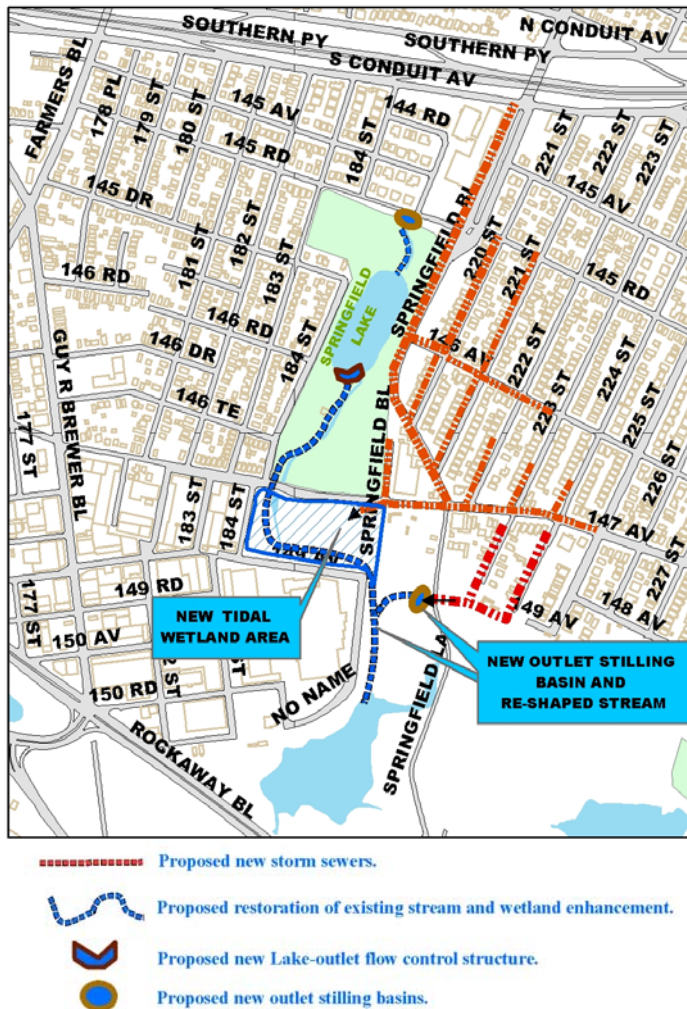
Proposed Springfield Gardens Stormwater Plan; Source: NYCDEP
